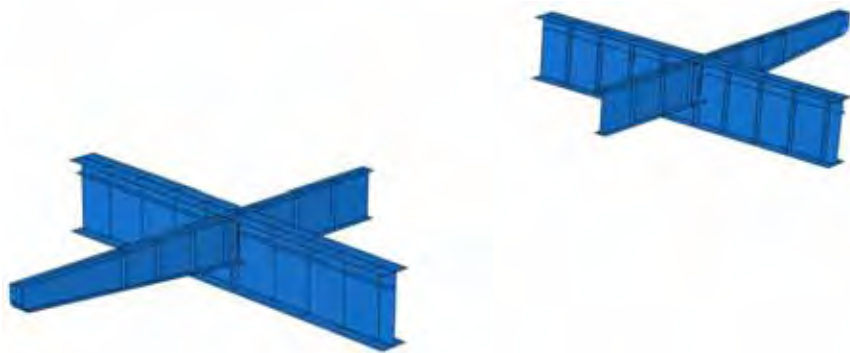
Sub Model Showing Connection of Floor Beam 2 to Girders 1 and 2
